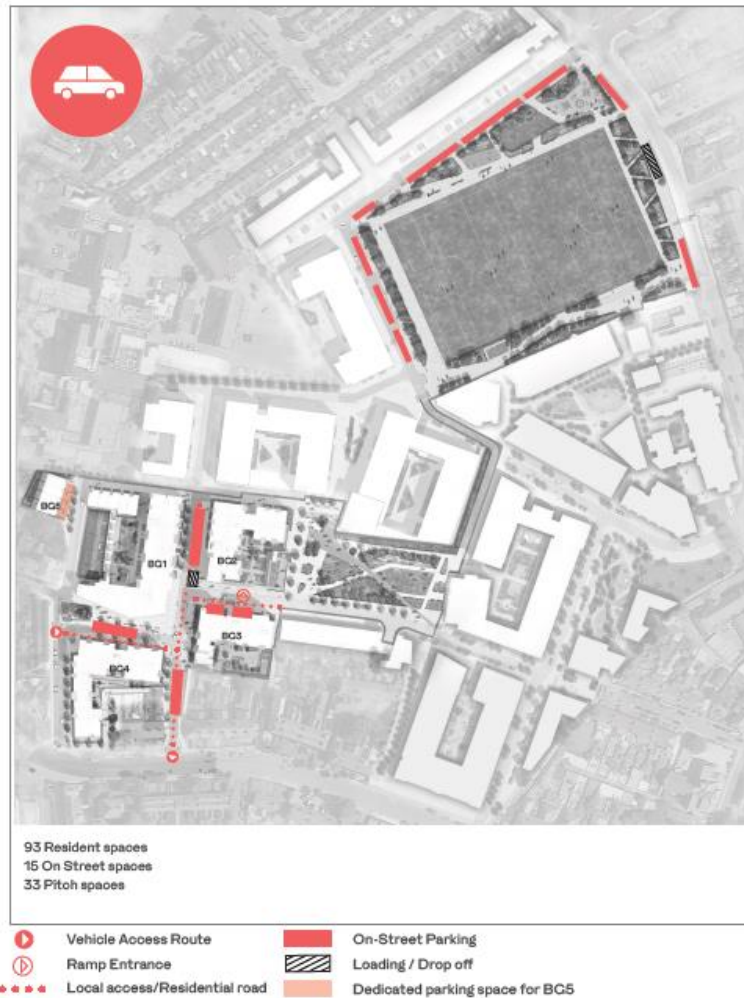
DISTRIBUTION OF SURFACE PARKING
